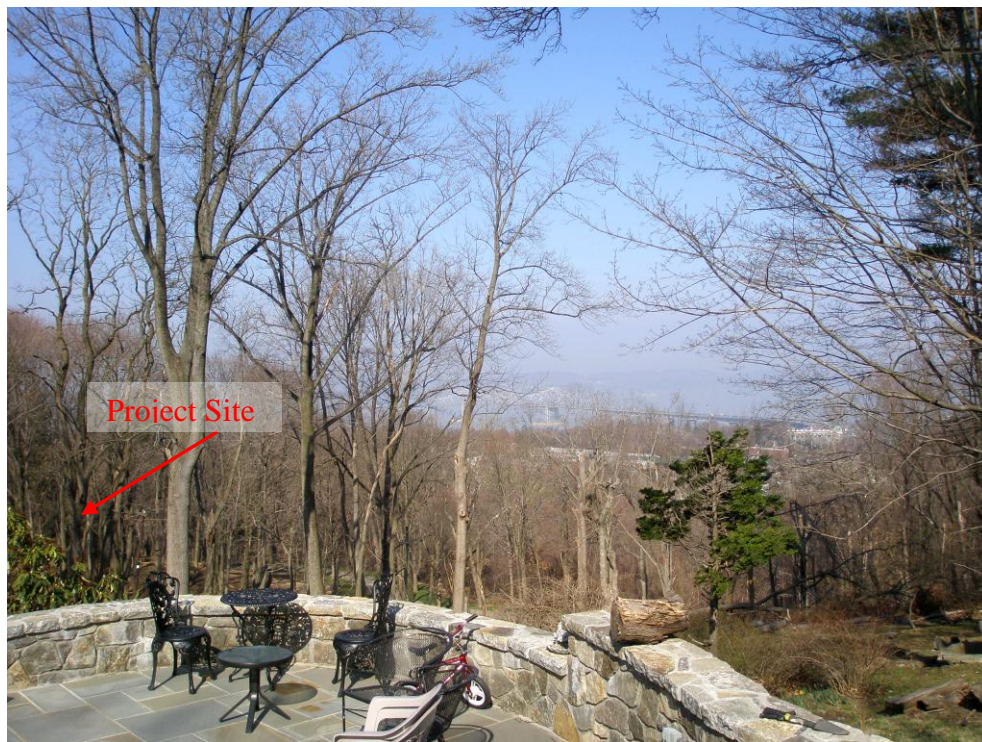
Photograph B. View of the Hudson River facing southwest (235 degrees) from 620 South Broadway (approximate elevation 420 ASL).
